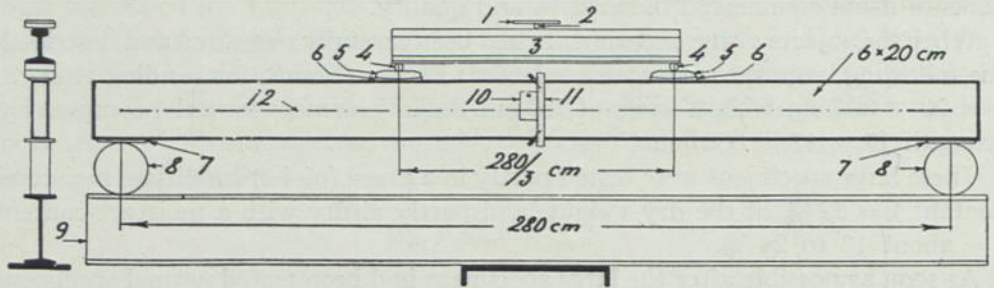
3. Test methods at Statens Provningsanstalt, Stockholm, for large timber beams and columns and for normal specimens for compression test
